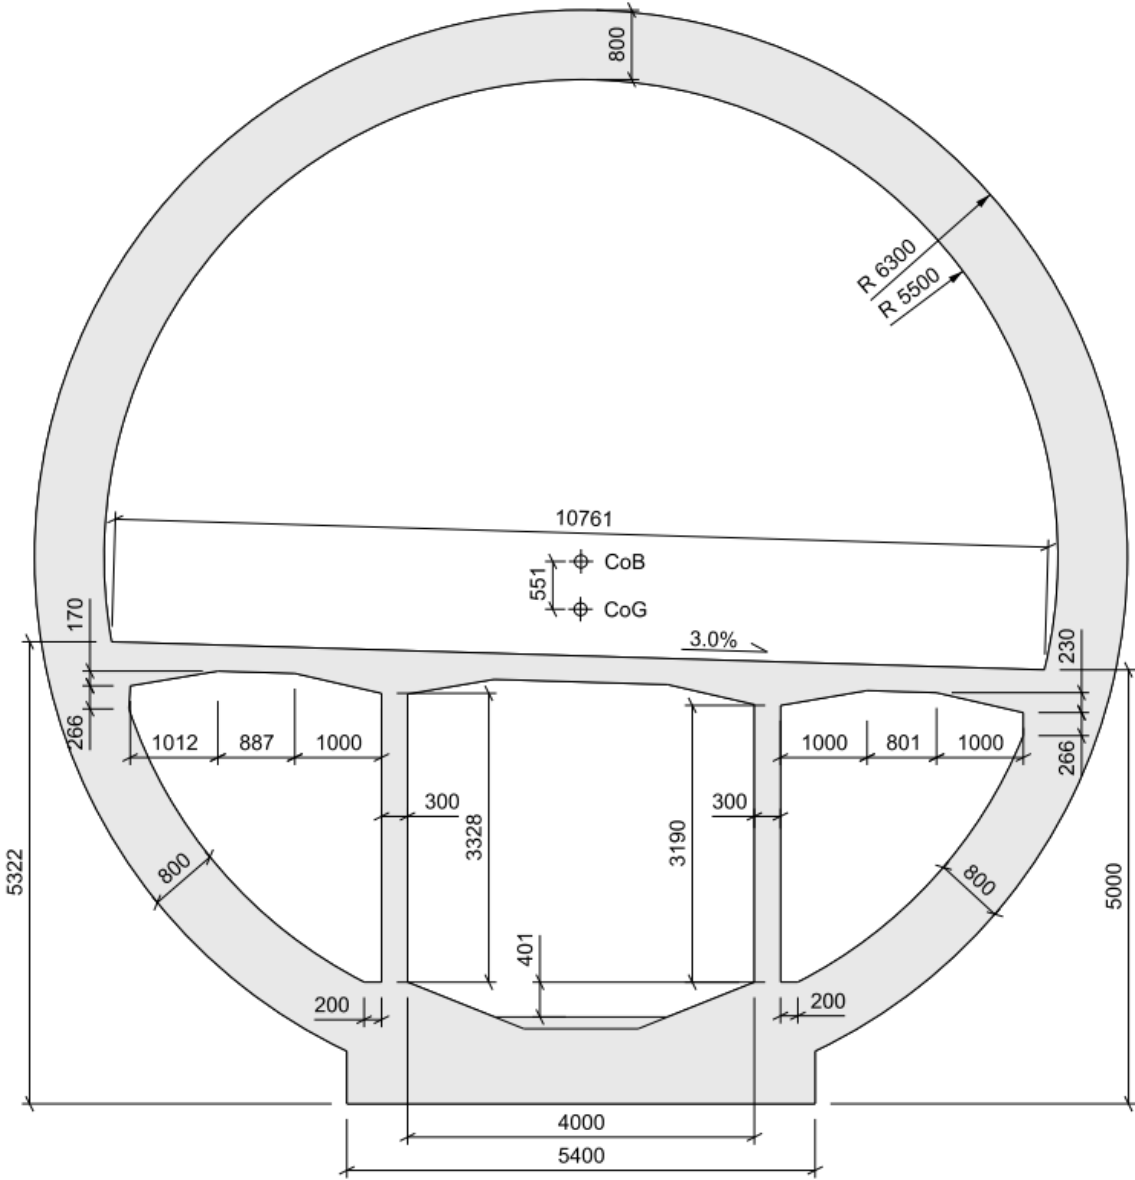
Enlarged cross section of the pipe without lay-by.
